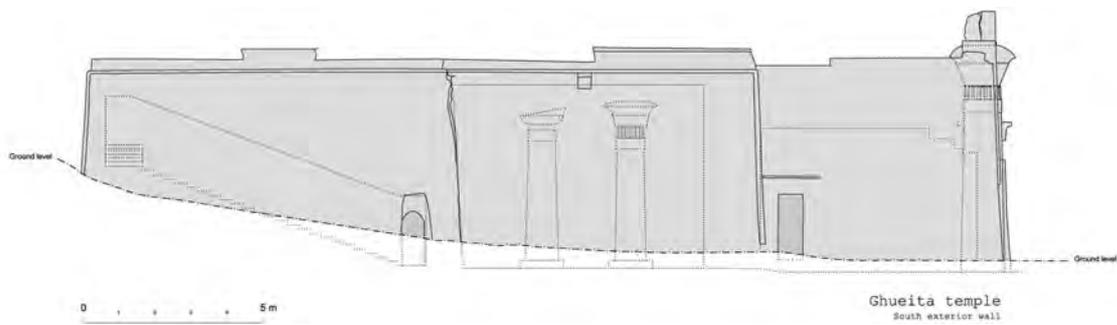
South exterior elevation, Ghueita Temple © TDRS.
